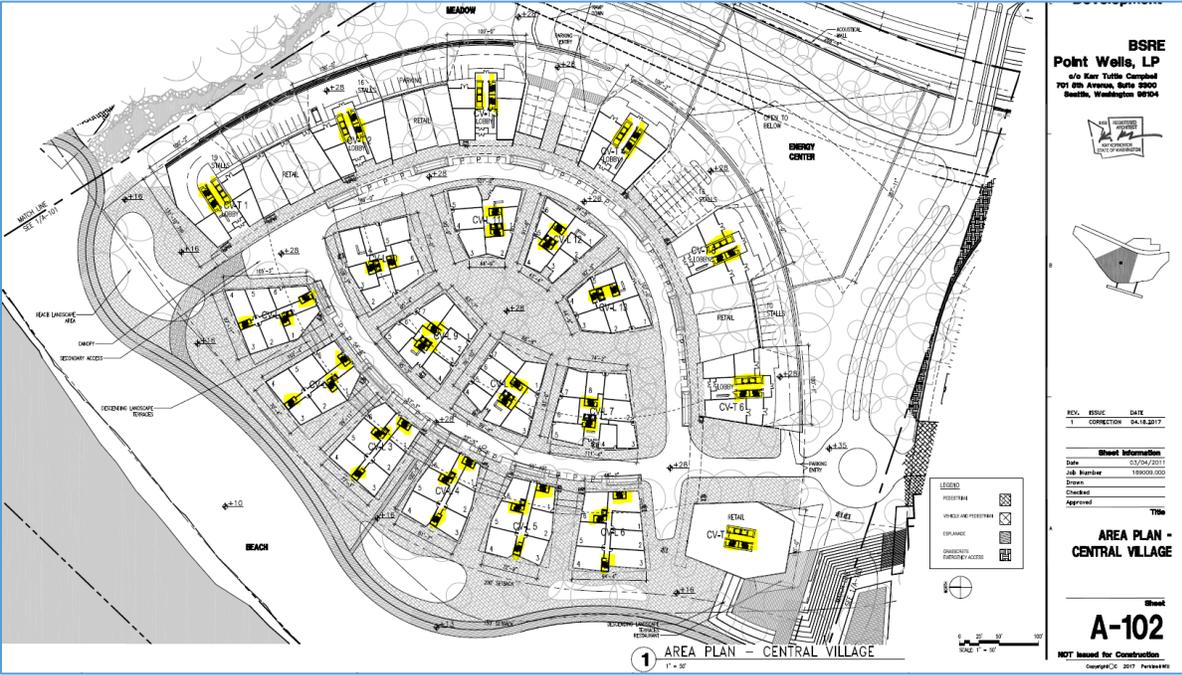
Central Village Area Plan with Elevators and Stairwells Highlighted (Adapted from Sheet A-102 [2017])
